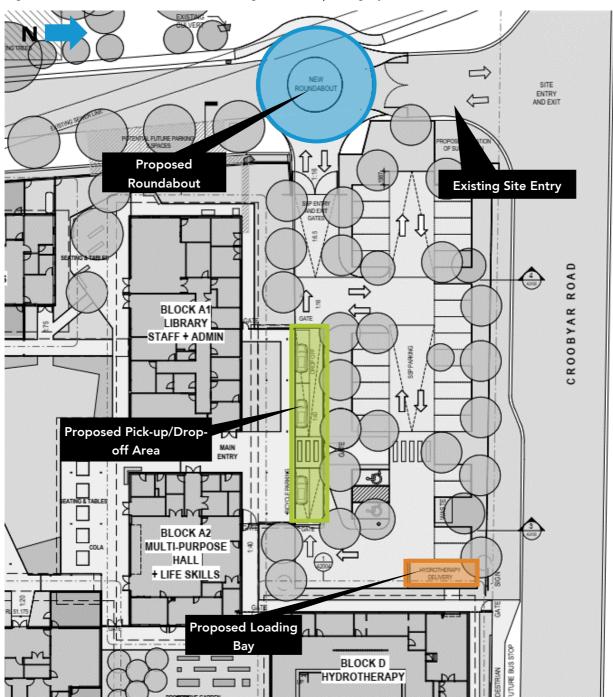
Proposed Site Access Arrangement (Source: GroupGSA)
